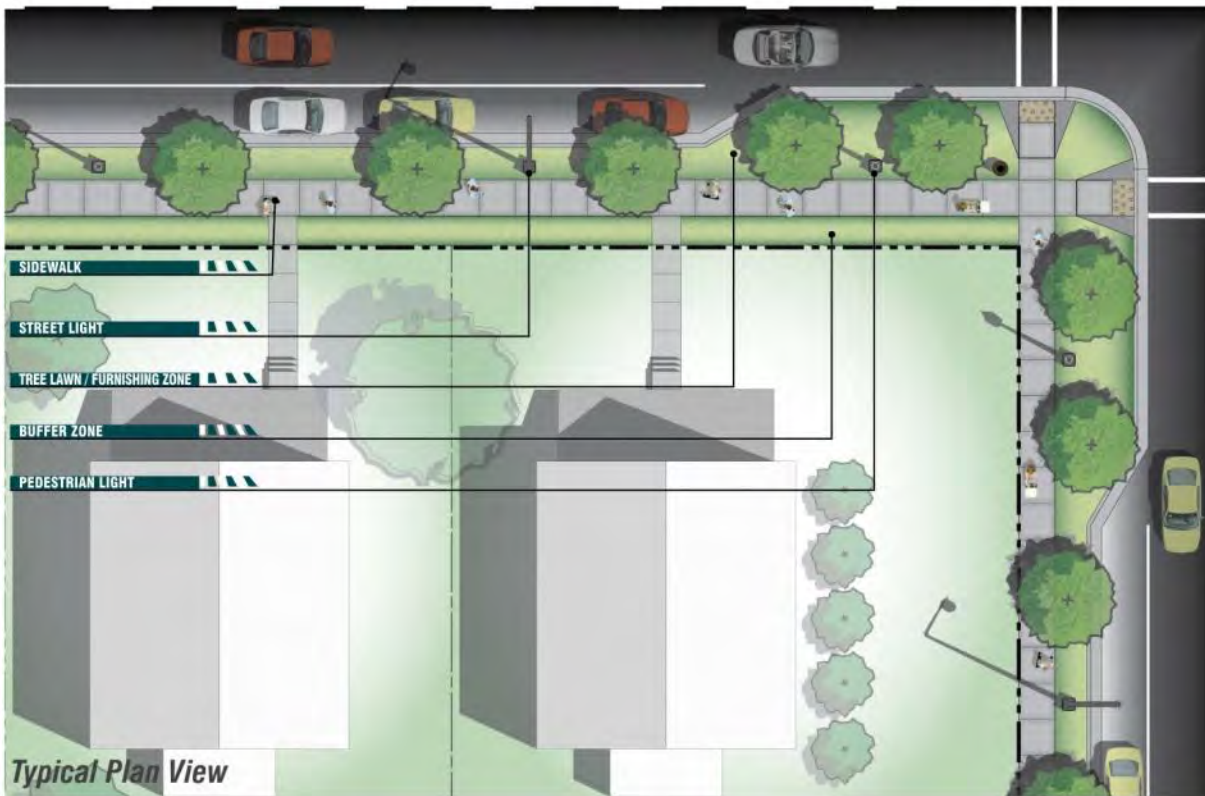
Preliminary Streetscape Alternatives – Bump Out at Residential Intersection
